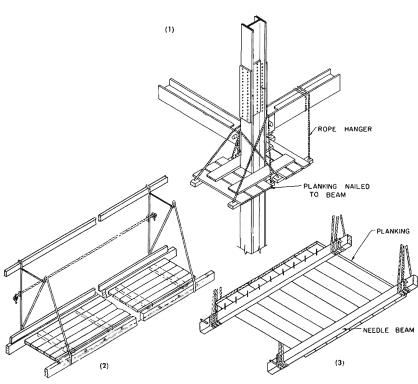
Examples of hanging scaffolds used in bolting and riveting steel bridges.
